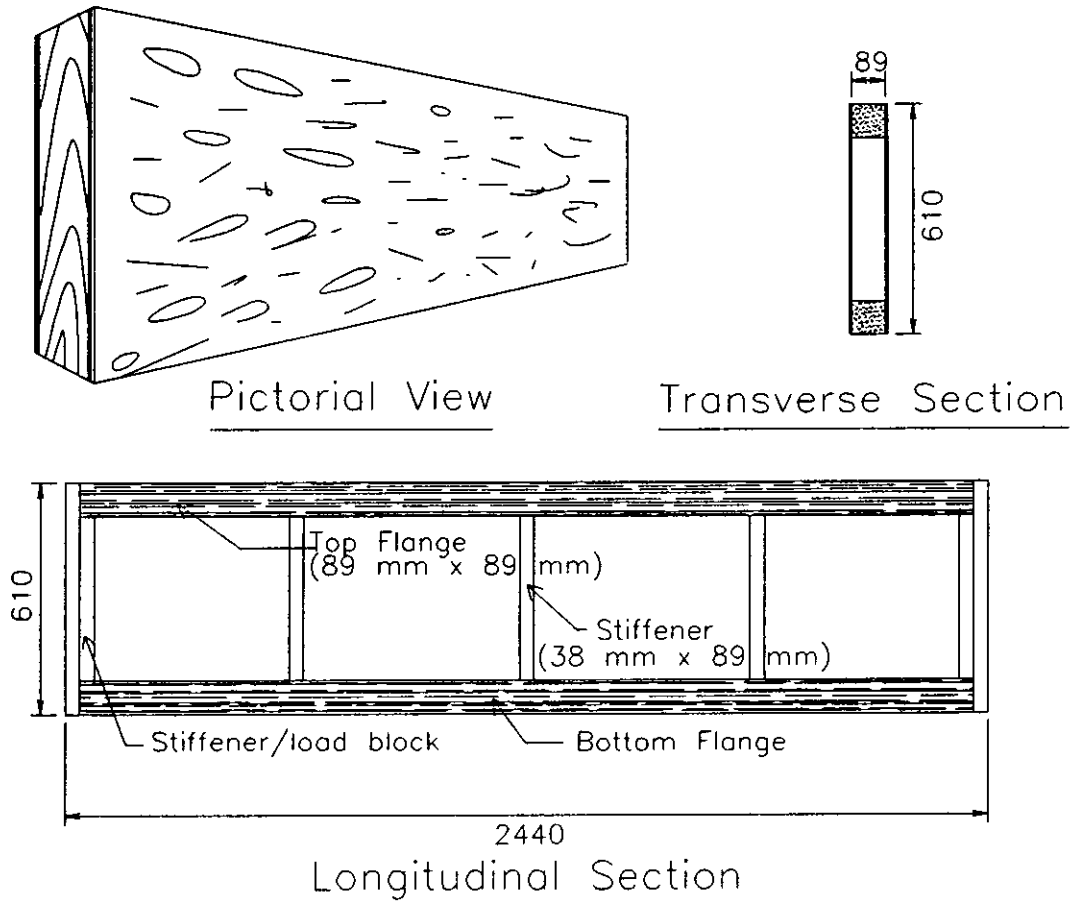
Box beam pictorial view, longitudinal section and transverse section
